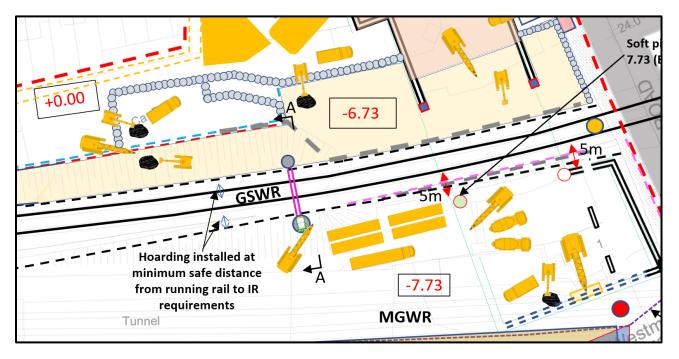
Plan view of location of underground track crossing for GSWR railway
